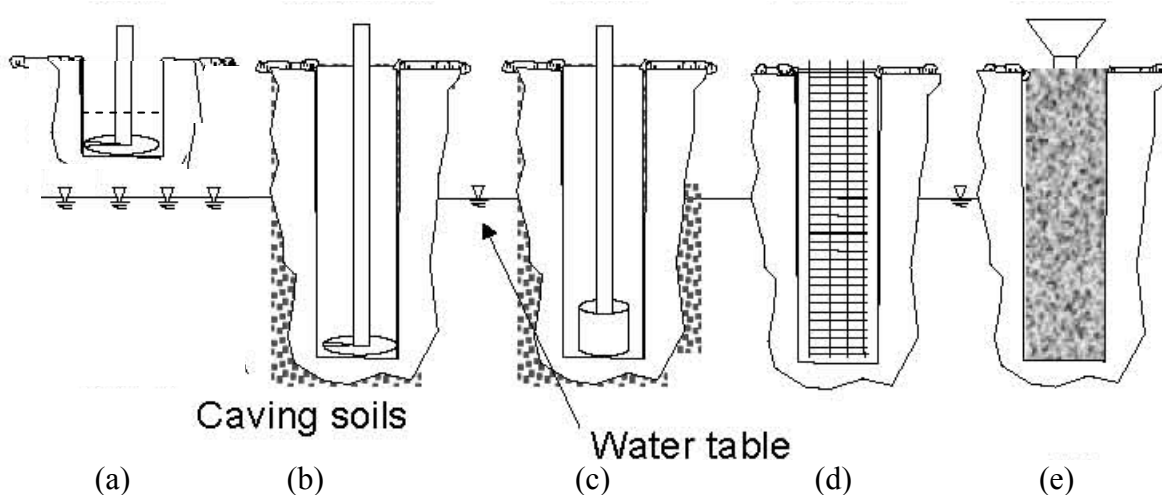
Steps in construction of drilled shafts by the wet method (a) start drilling and introduce slurry (bentonite or polymer) in the excavation PRIOR to encountering the known piezometric level, (b) continue drilling with slurry in the excavation, (c) clean the excavation and slurry, (d) position reinforcement cage, and (e) place concrete by tremie.
